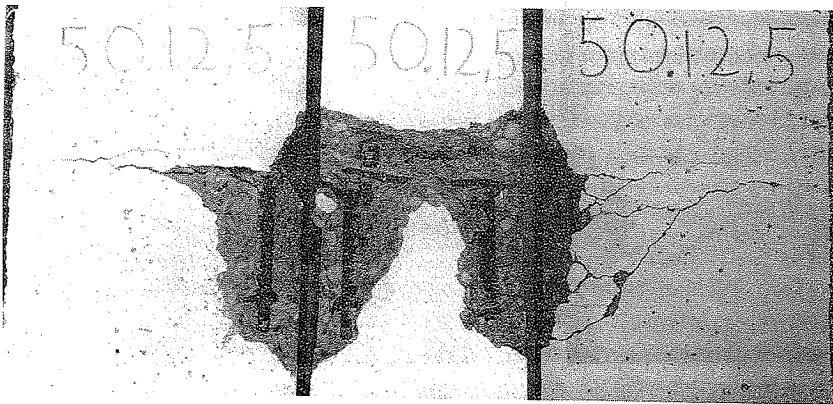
Failure of S.B.-specimen No. 50/12.5.
